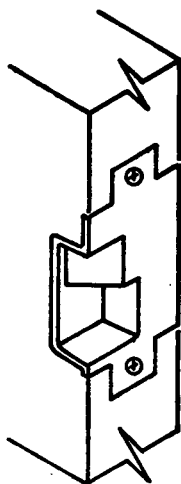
Typical "open-back" latch strike for pairs of doors, installed in edge of inactive leaf when permitted by individual published listings.
